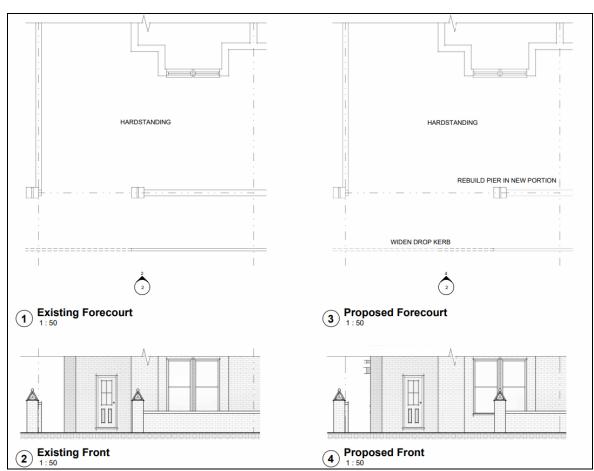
Plans submitted for 13 St David's Road (21/01662/HOU/ APP/Z1775/D/22/3297683)
